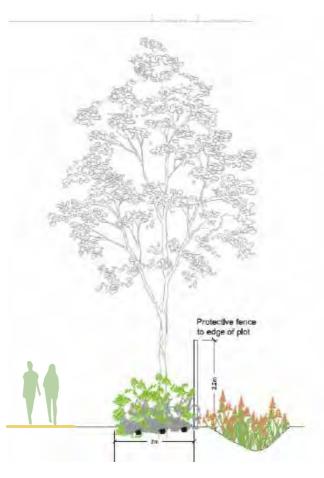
Secure fencing with either landscape strip and/or drainage
